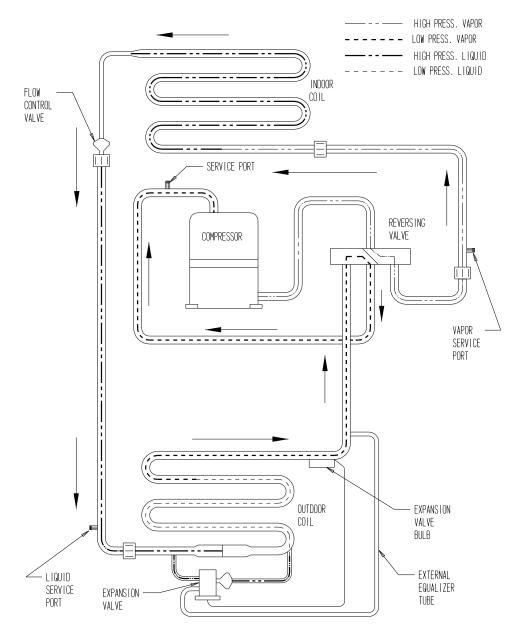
TYPICAL HEAT PUMP SYSTEM COOLING CYCLE
